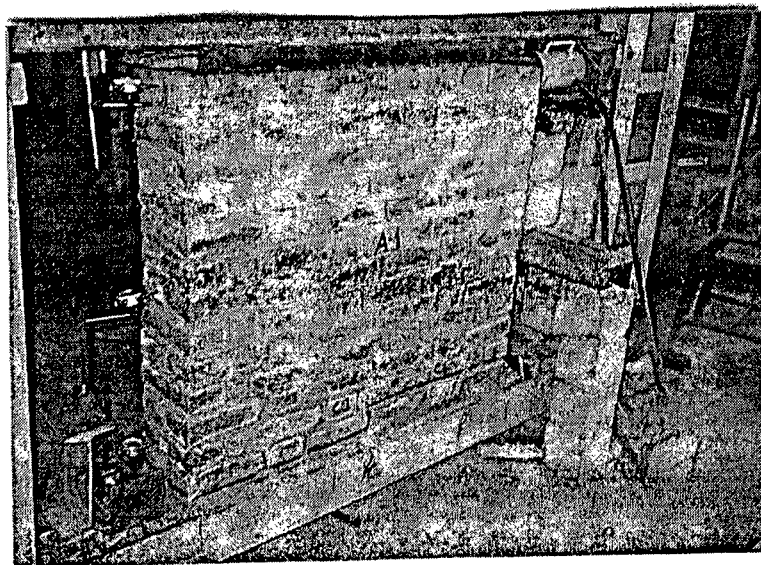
Test setup for Wall Panel under Static Lateral Load
